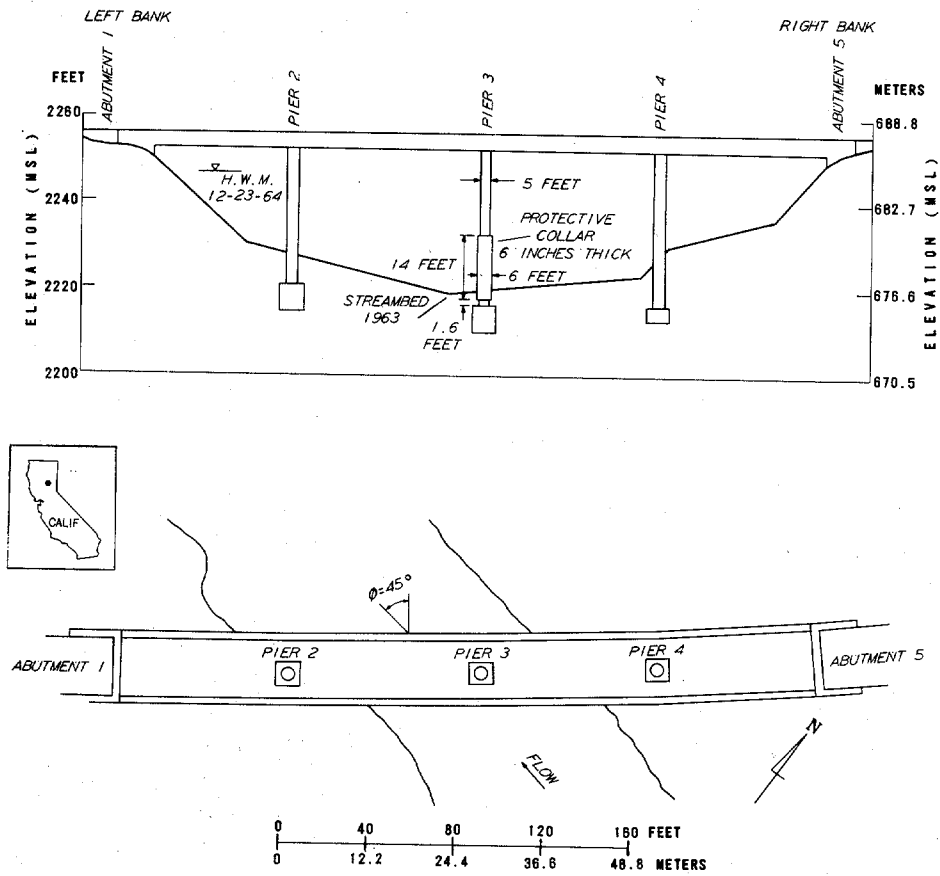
Plan and cross section of North Yuba River at SR-49 bridge near Goodyears Bar, California.
